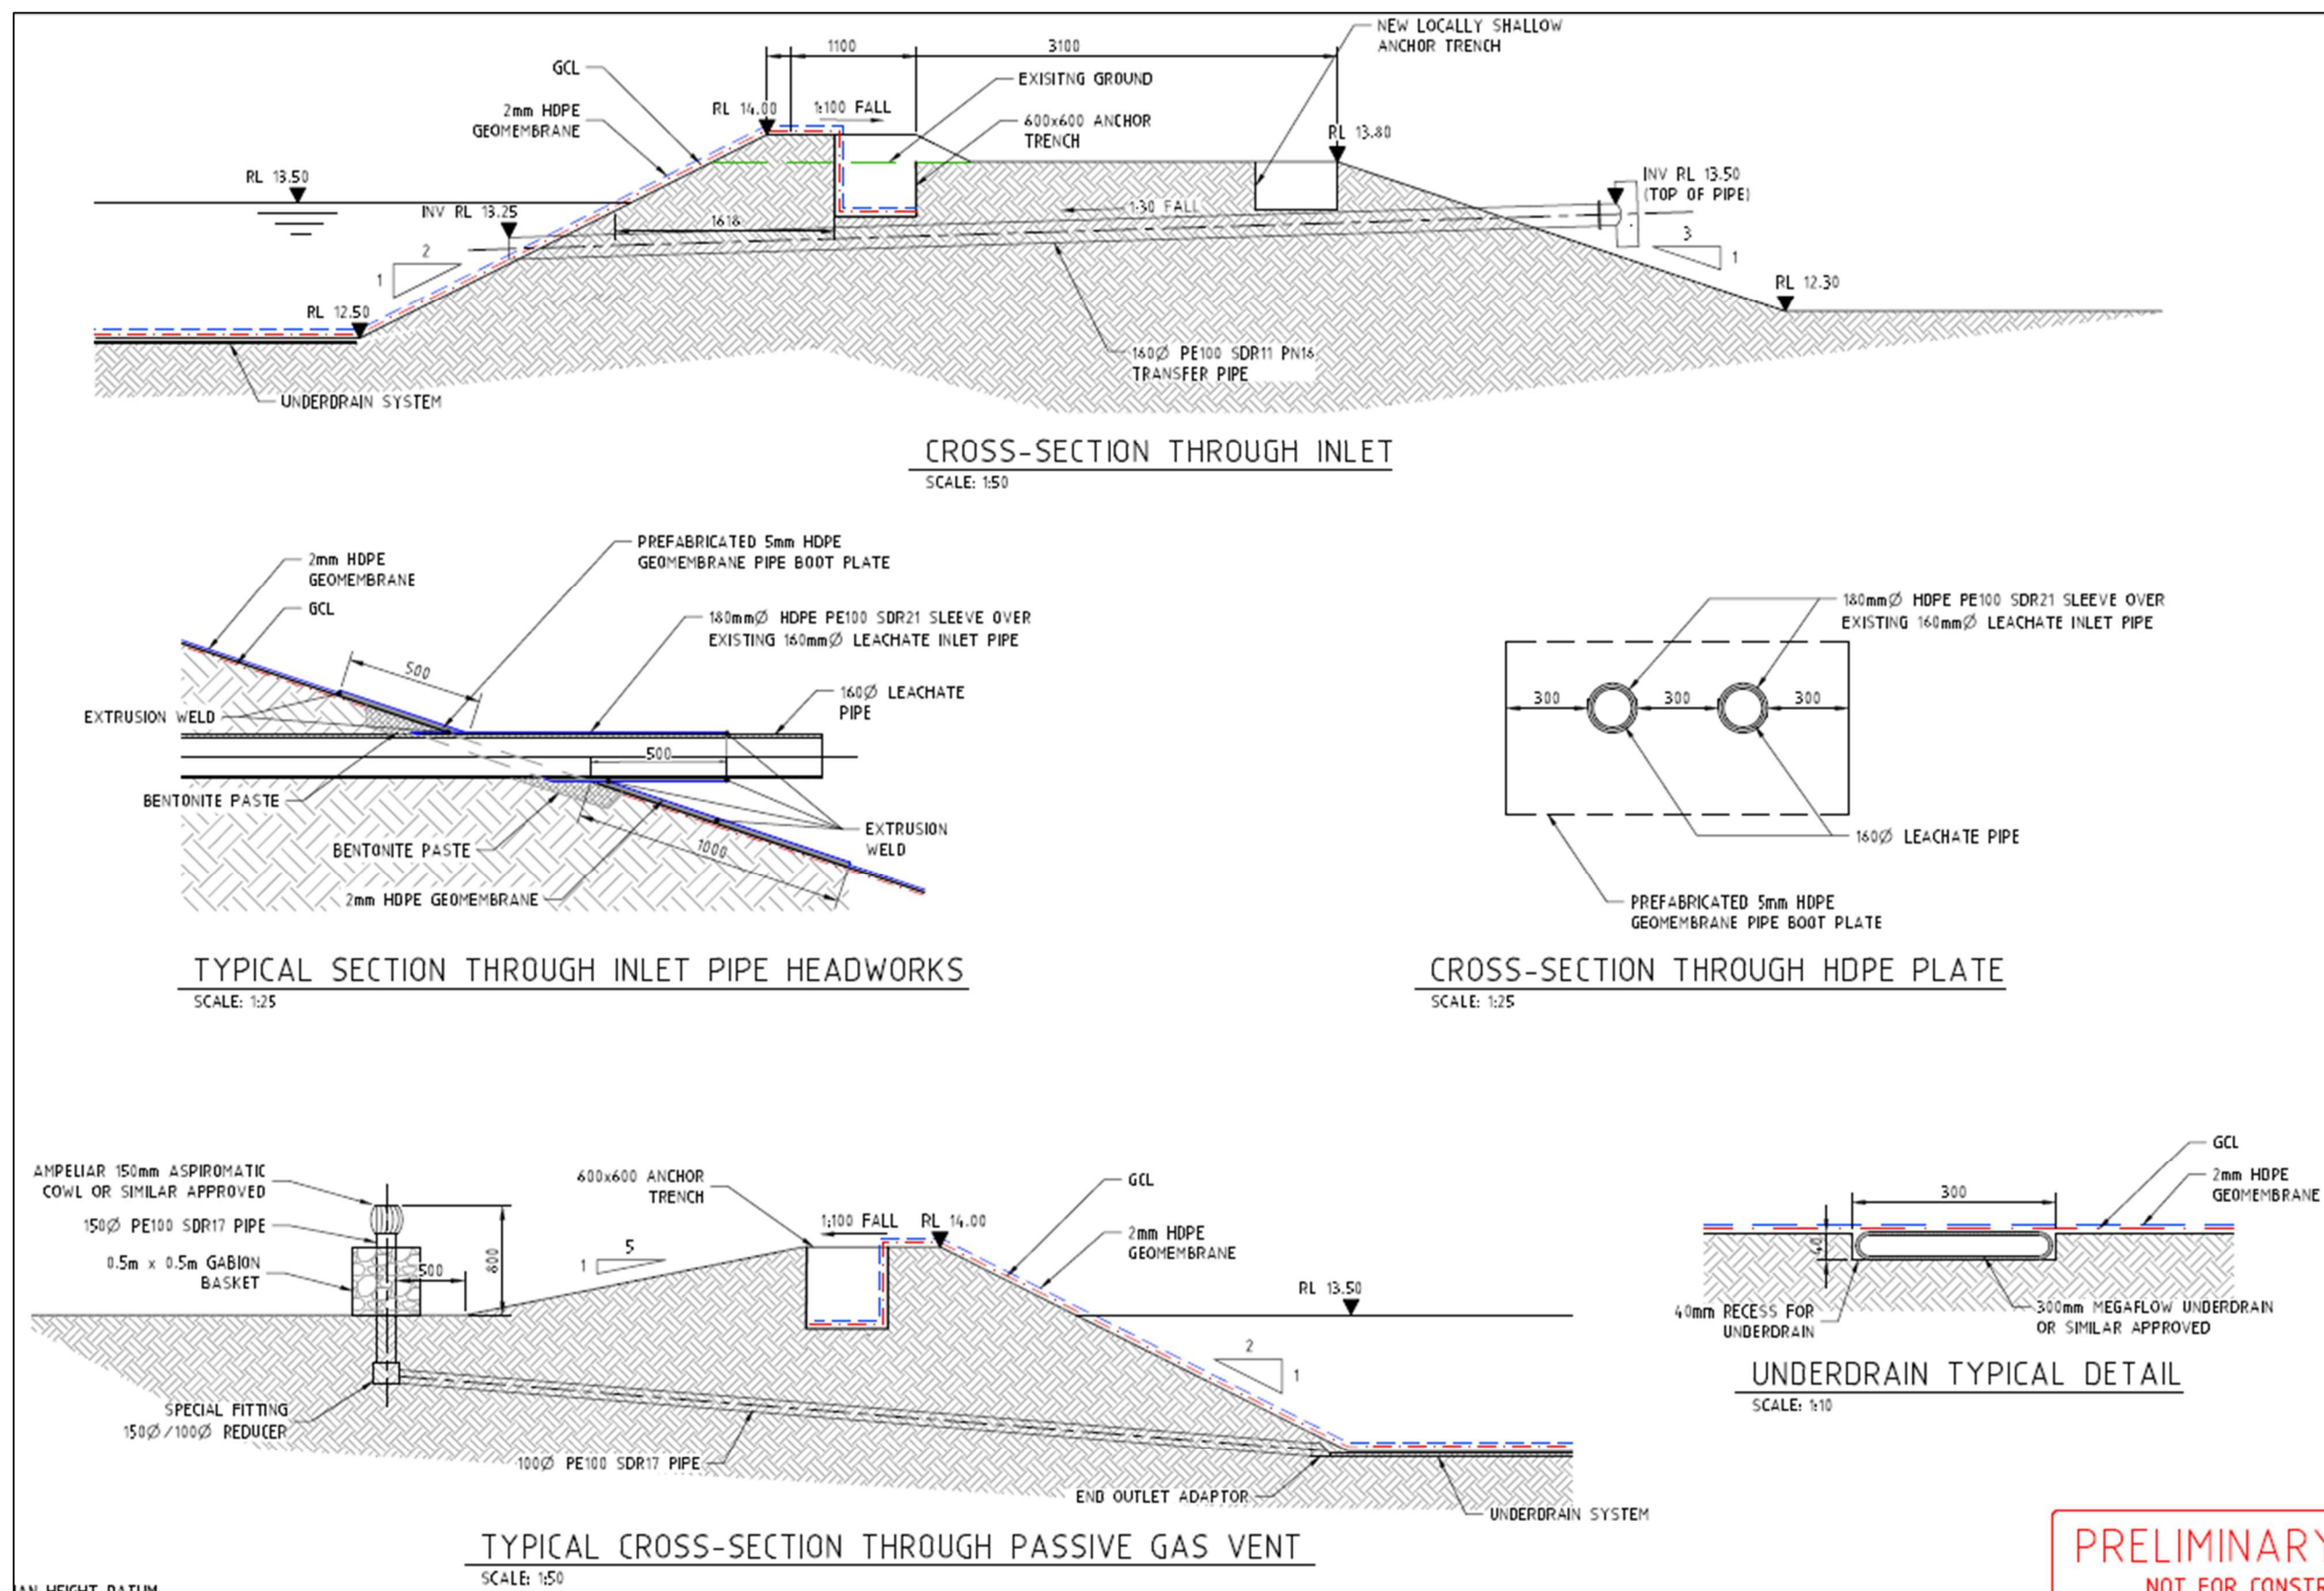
Preliminary construction plan for the new evaporation pond 2 liner and underdrain (source: Talis Consultants 2020, *Environmental Assessment Management Plan*).
